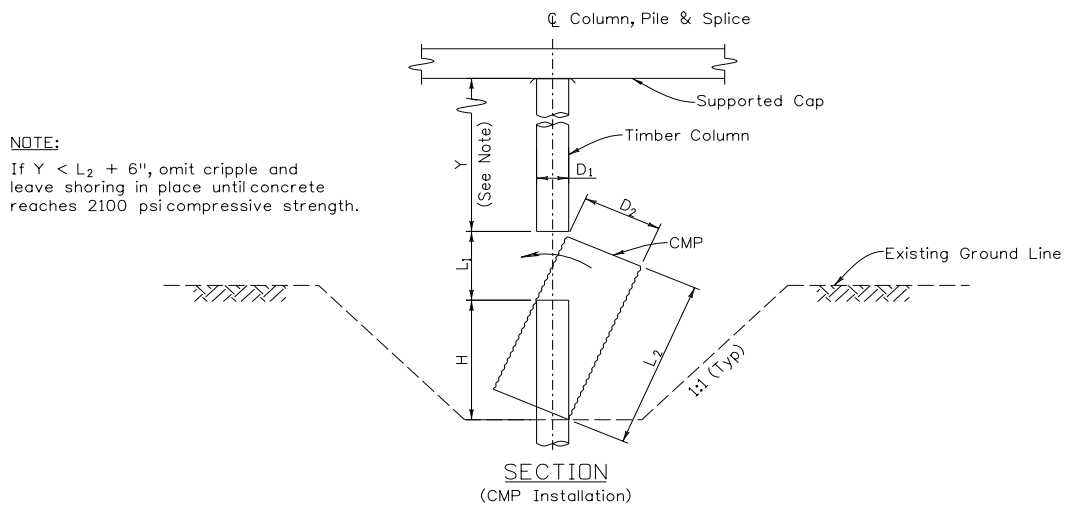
(G)-1 Sample Repair Detail for a Timber Pile/Column Repair
